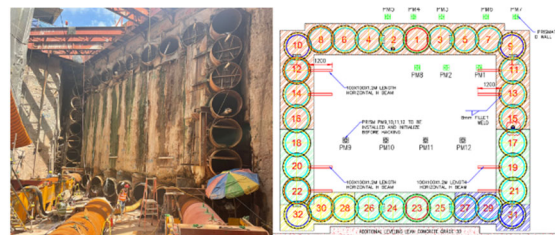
Cross Section of Pipe Installation using Dual MTBM
